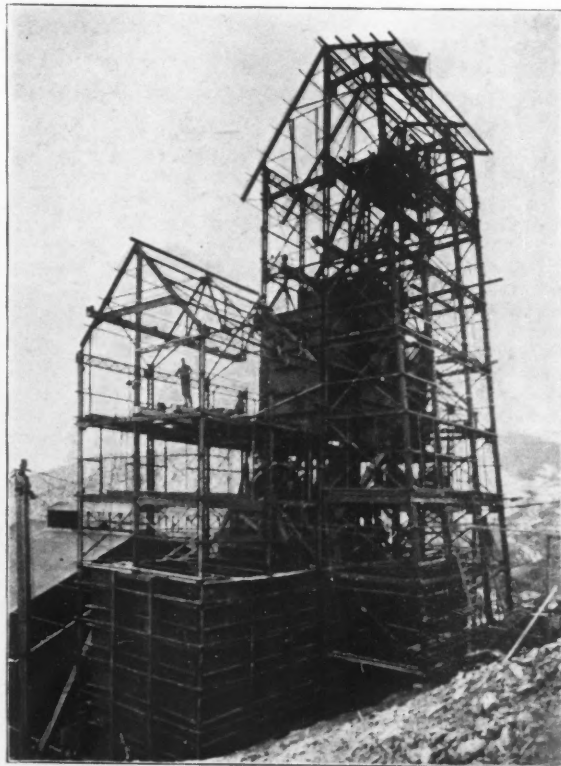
UPPER SECTION OF MILL UNDER CONSTRUCTION.
